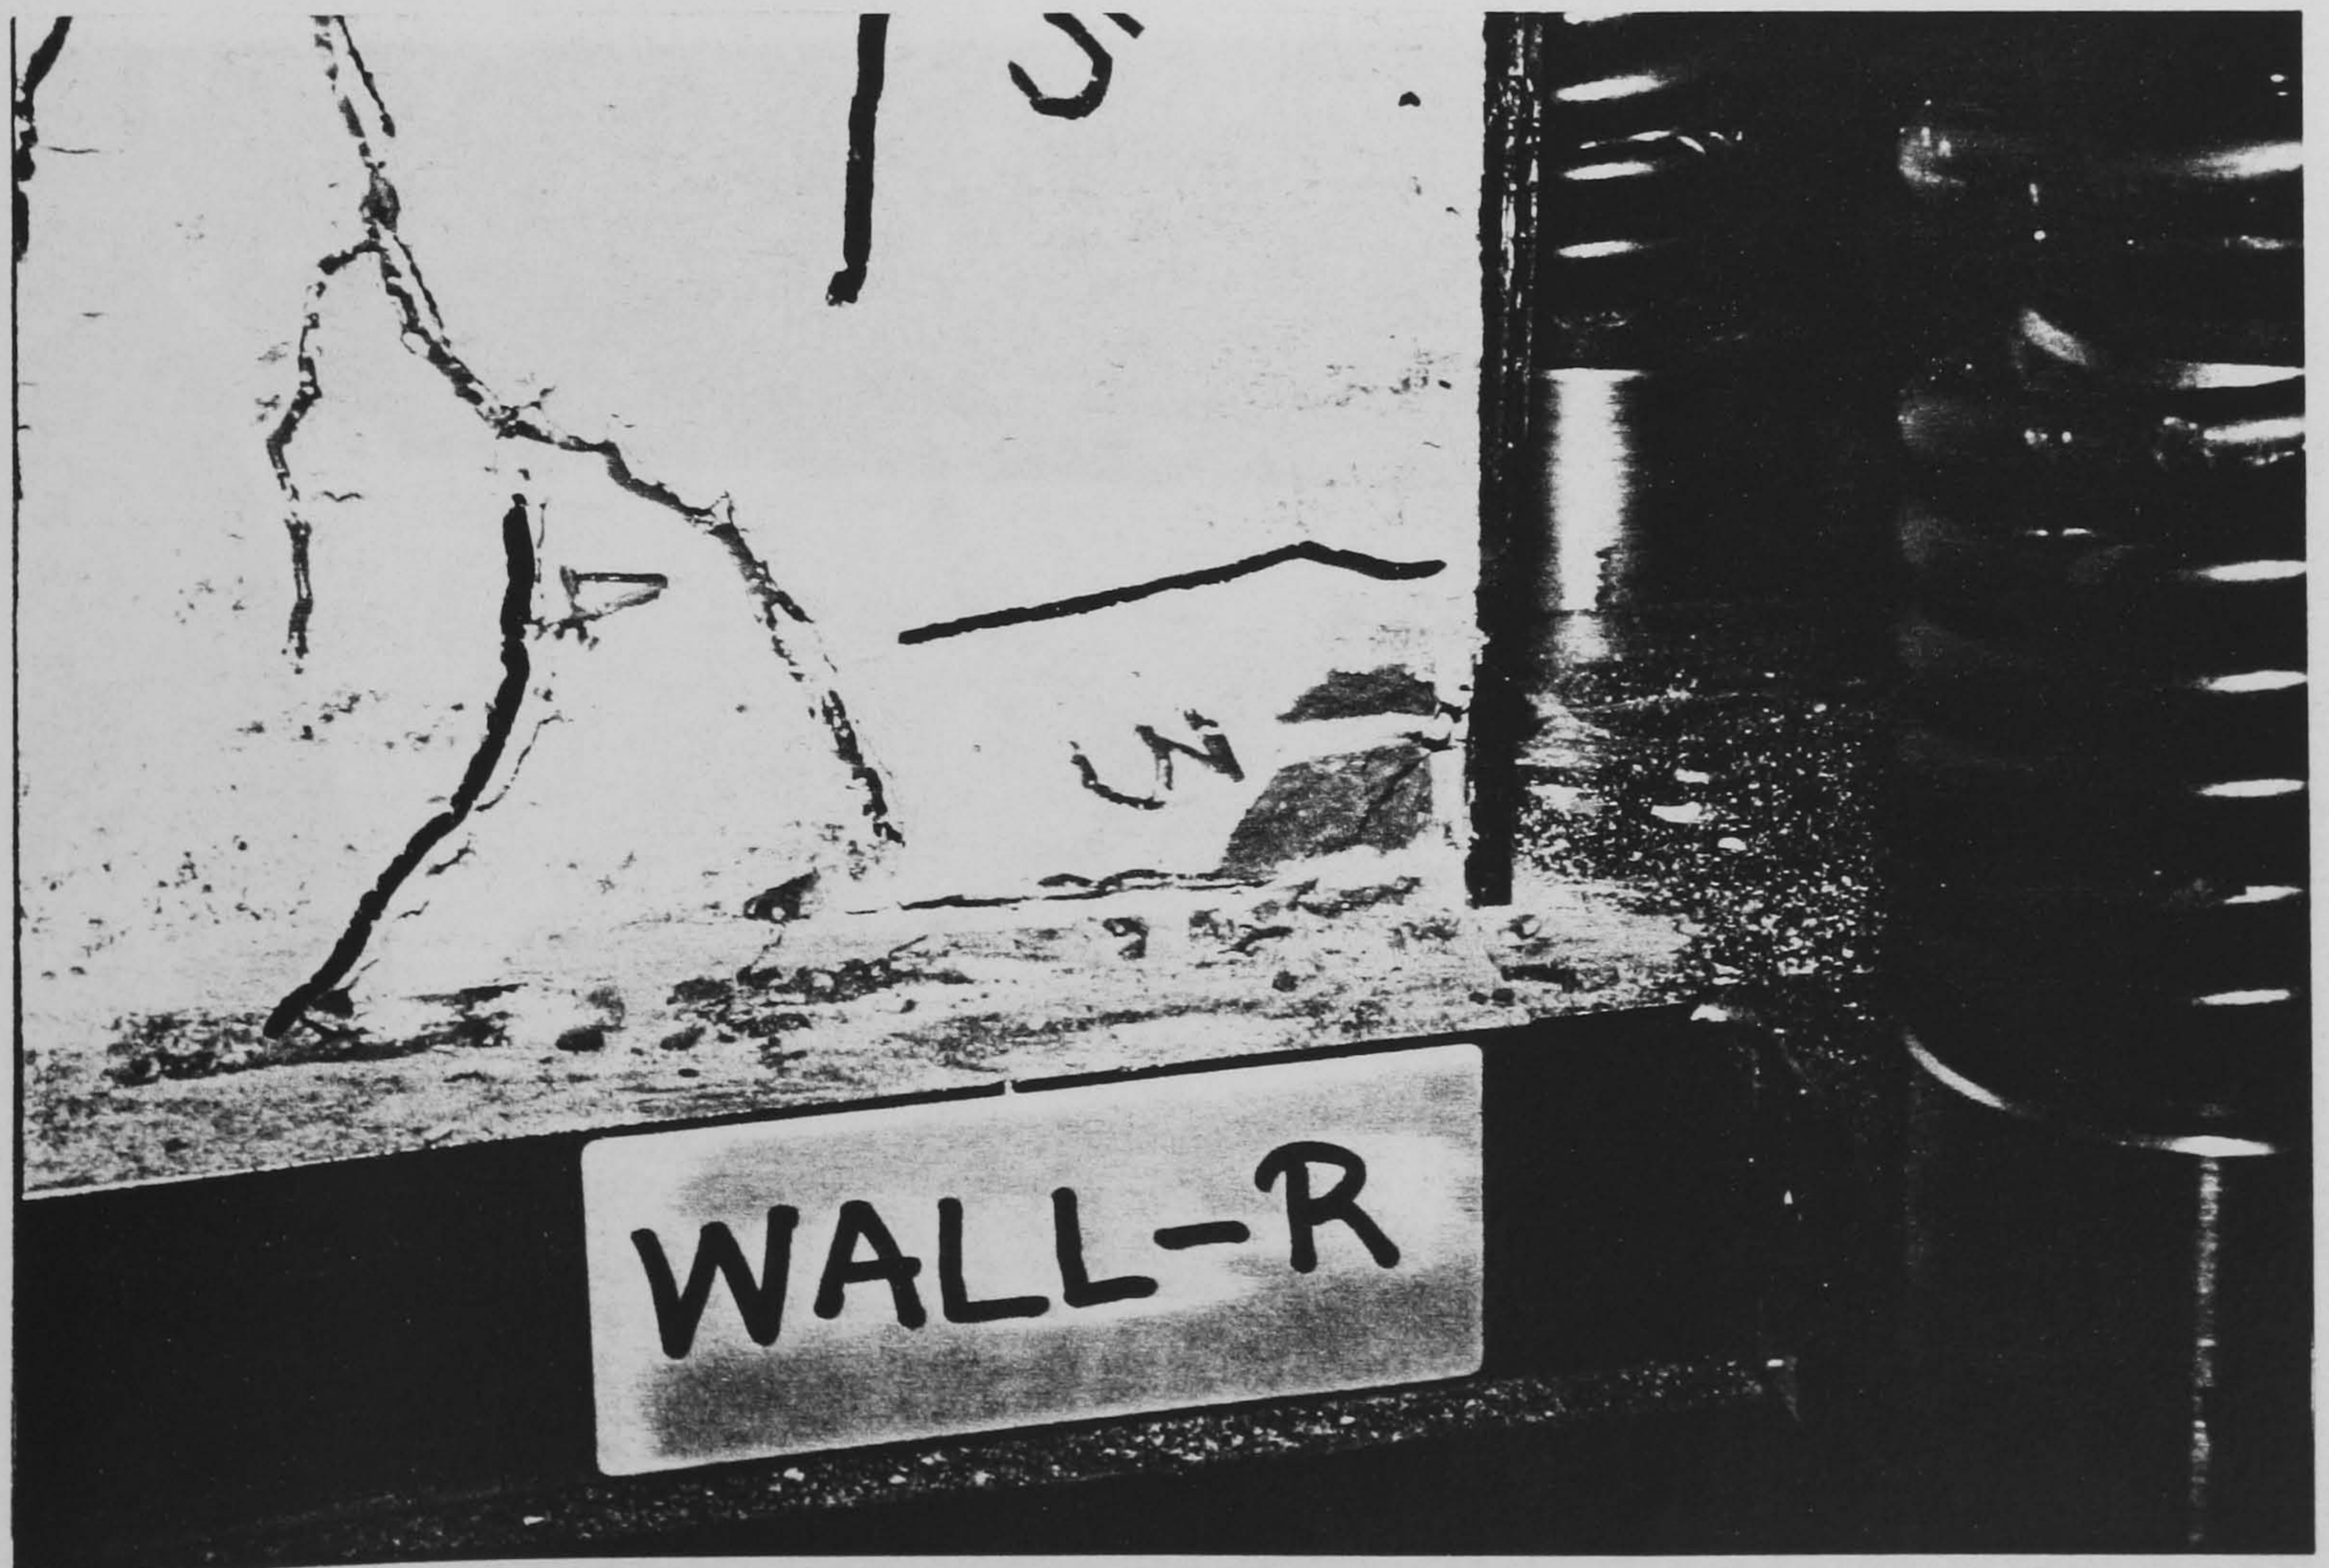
Close-up detail of opposite (lower right) corner crushing (wall-R)
